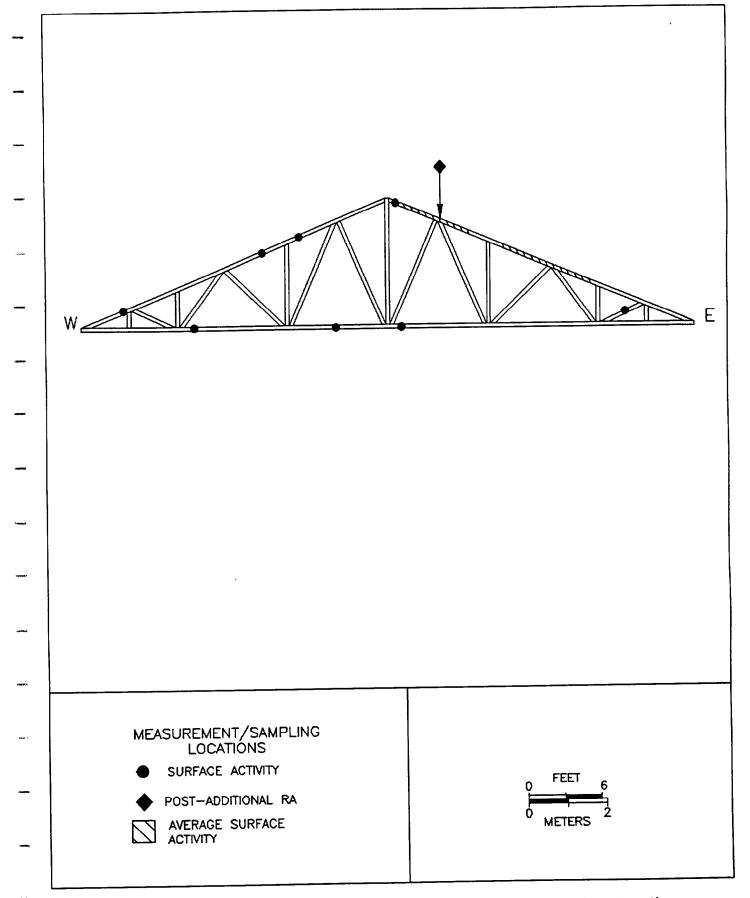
Building 3, Truss 11 — Measurement and Sampling Locations
